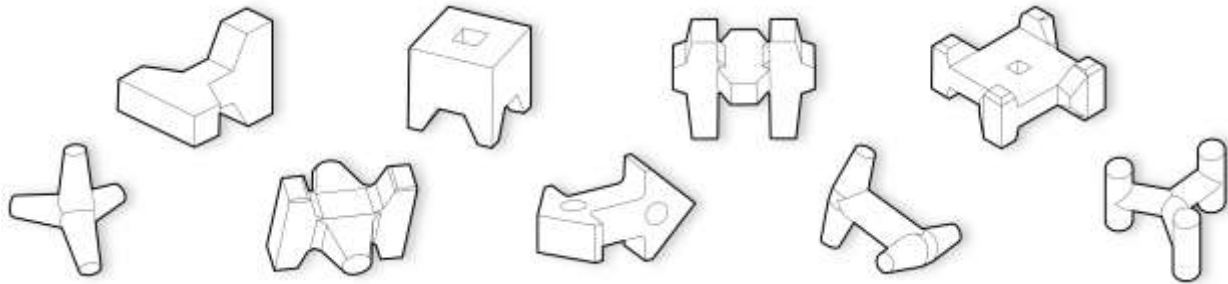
Common shapes of seawall concrete blocks used for shoreline protection [178].
